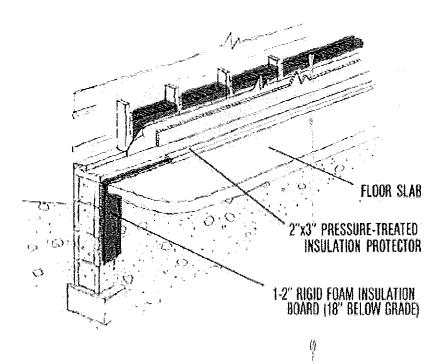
Foundation perimeter insulation-inside (R=2.2). Perimeter insulation for floors in new construction may be placed around the inside perimeter of the building.
